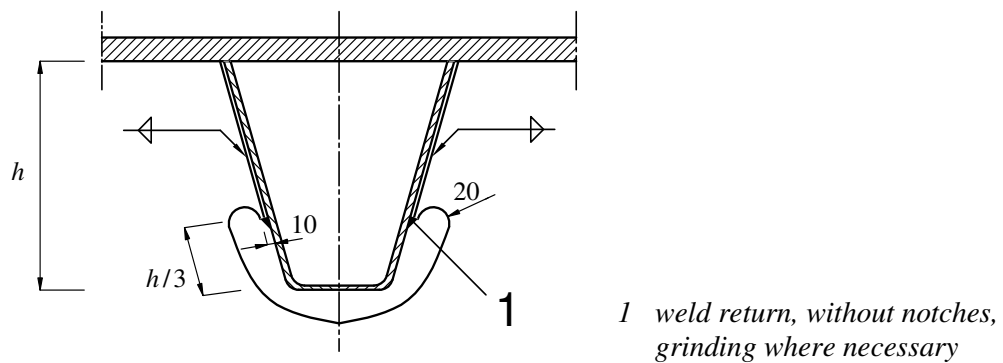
Connection between the closed stiffener and the web of crossbeam
